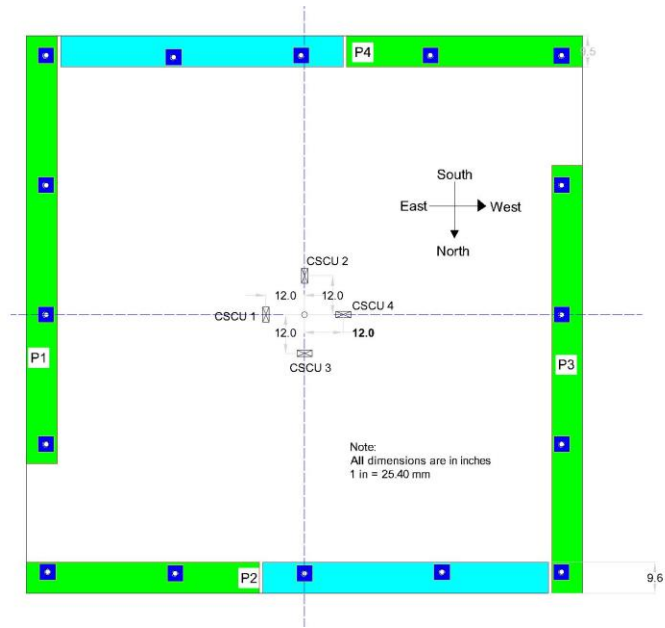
Concrete Strain Gauge Location for Slab Specimen C
